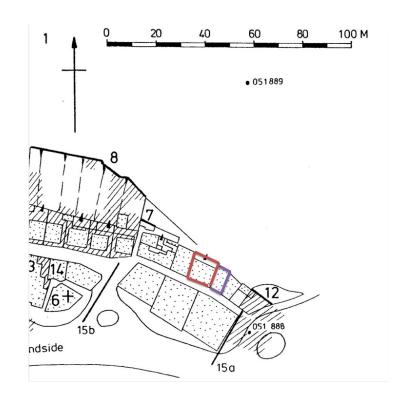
Site plan. Extract from a plan in An Archaeological Survey of Scarborough (Pearson, 1987) showing 60A/60B Quay Street outlined in red and 62 Quay Street in blue
